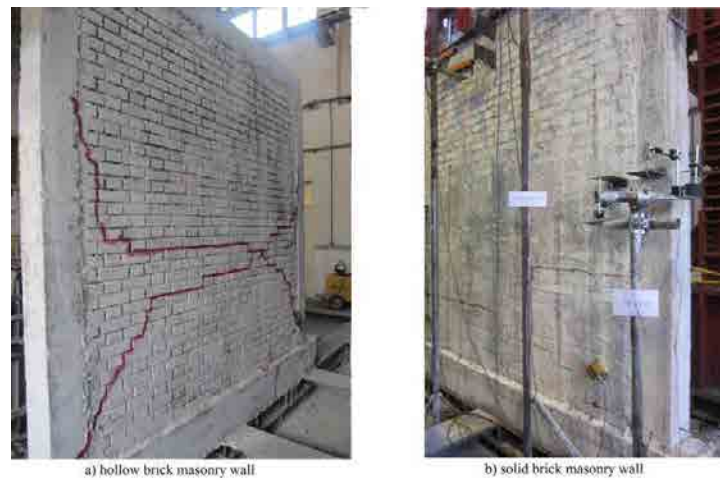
Hollow brick and solid brick masonry walls with bed-joint sliding failure
